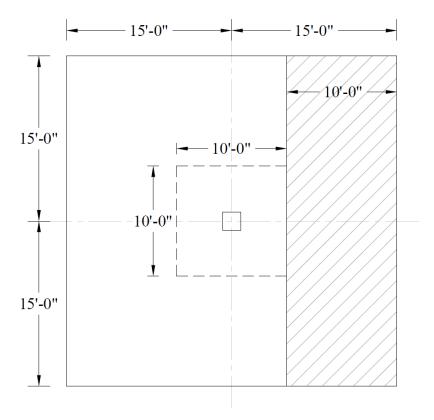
Critical Section at the Face of the Drop Panel for One-Way Shear
